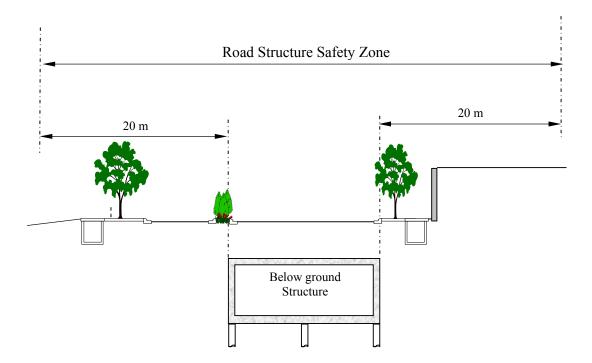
Definition of Road Structure Safety Zone for structures below ground
